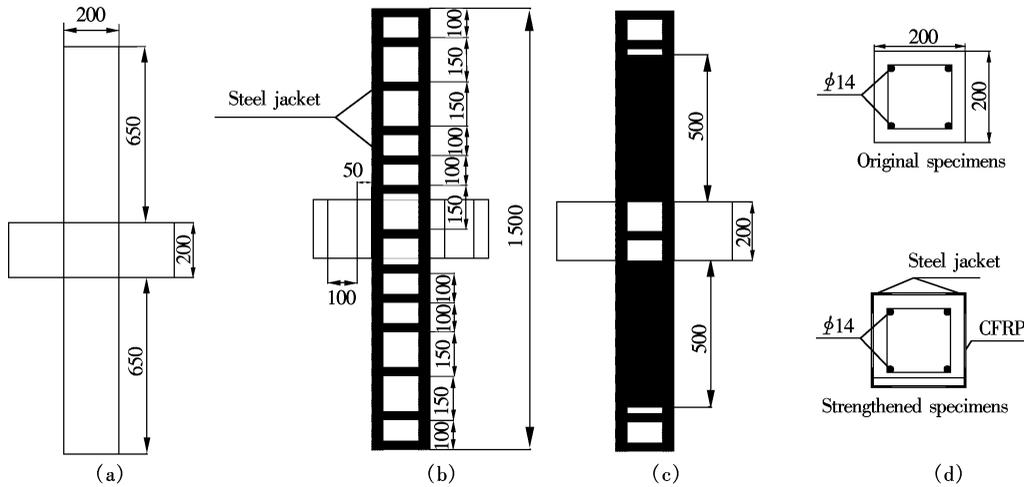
Geometrical size of the strengthened column(unit: mm)
